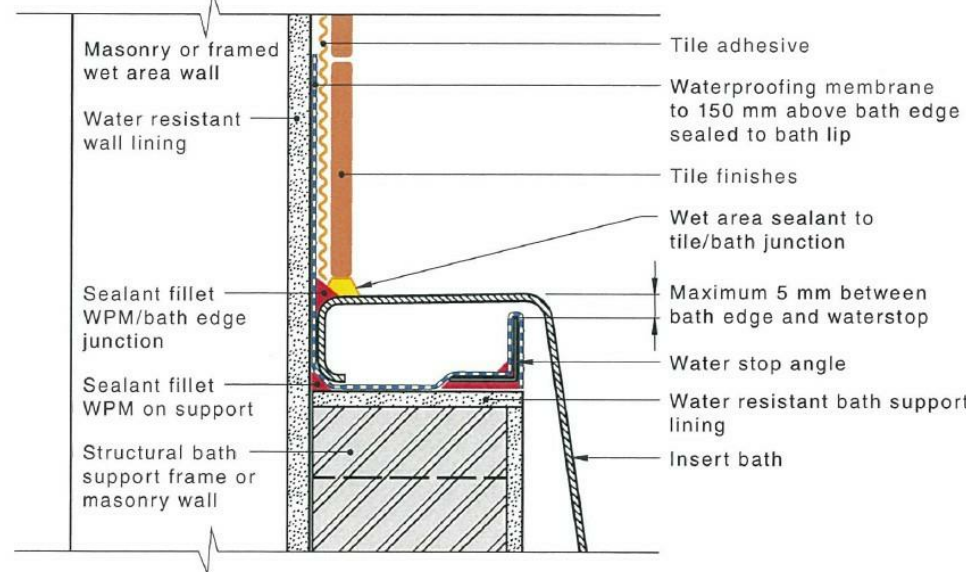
(B) — Shower over bath — Fitted bath — Fitted against wall
